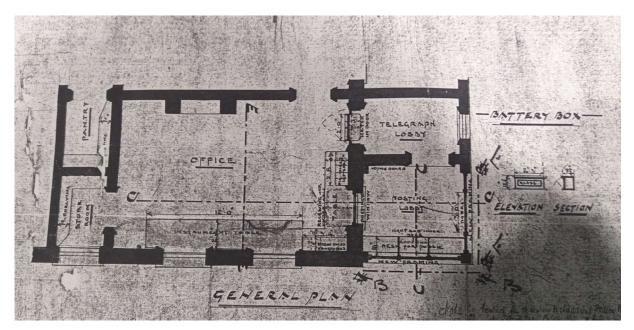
Floorplan dating to 1885 that showed that the original extent of the post office building, which excluded the verandah and the two projecting bays to the main elevations (built 1900) (Saleta 2016).
